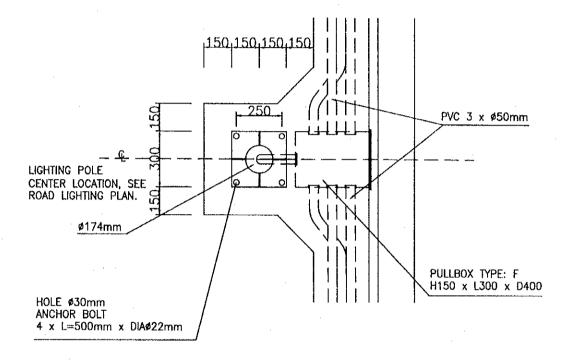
DETAIL OF POLE FOUNDATION FOR TYPE B2, A2 (SCALE 1/20)
